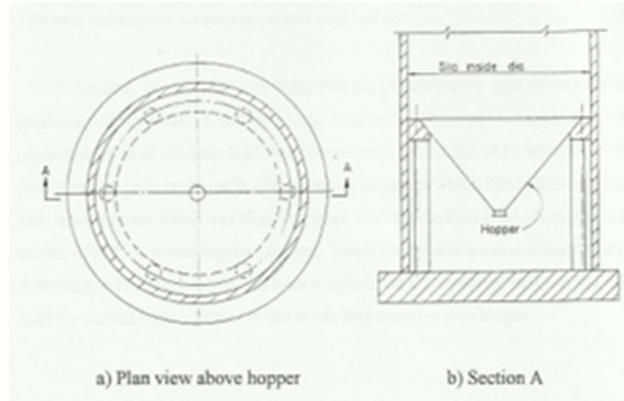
Concrete ring beam columns supporting a conical hopper
